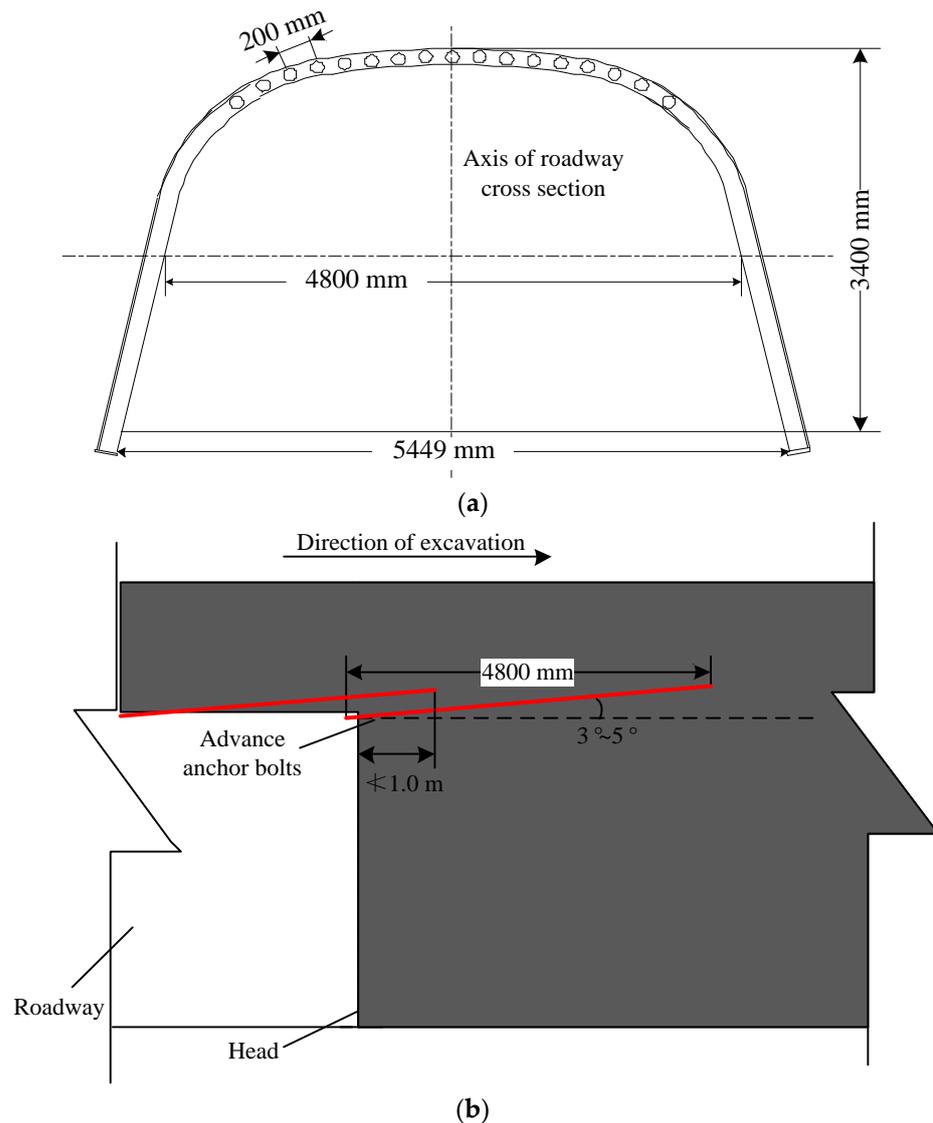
Layout of advance bolts in the roadway. (a) Roadway section. (b) Roadway cross section.
